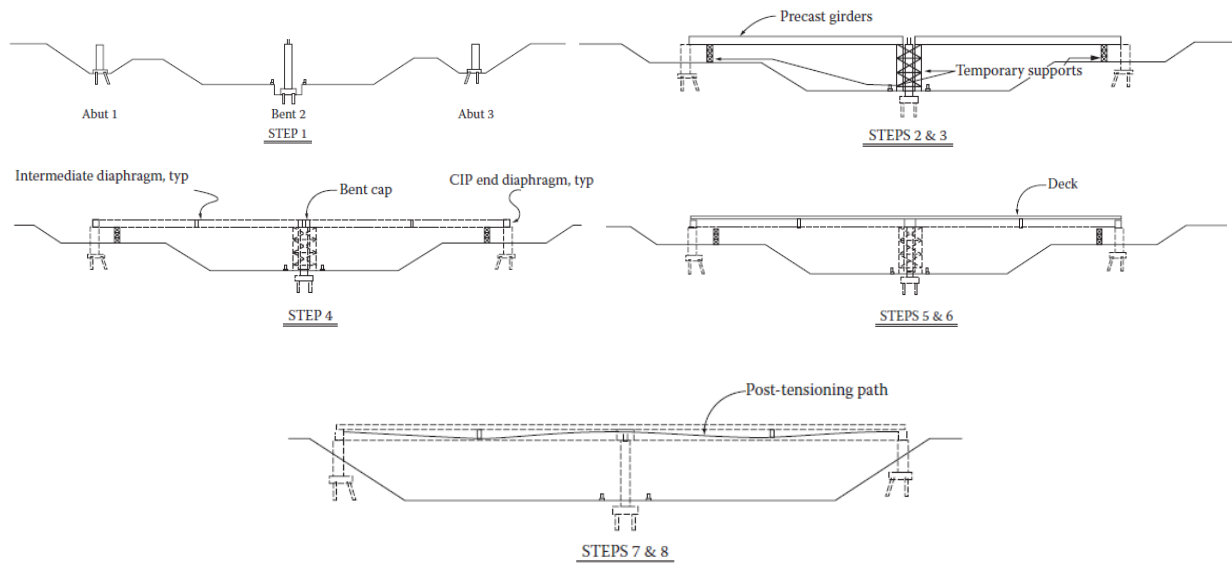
Post-tensioning spliced girders (Ma and Low 2014)
